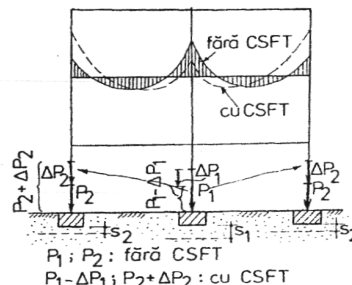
Static indeterminate frame with isolated foundations located on an un-deformed foundation soil using the conventional calculus
